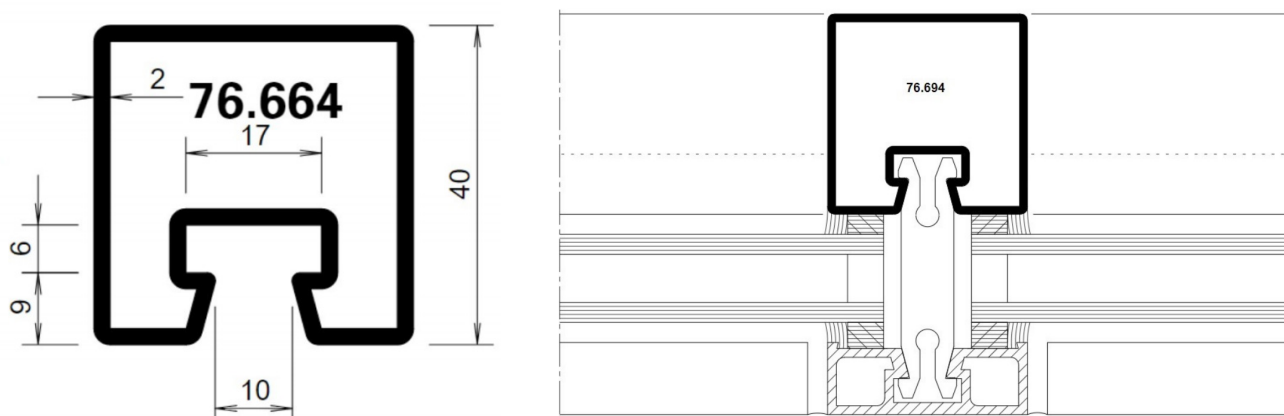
Jansen Viss Profile 76.664 (left) cross-sectional detail, and (right) original fixing detail with structural sealant (source: ODS)
